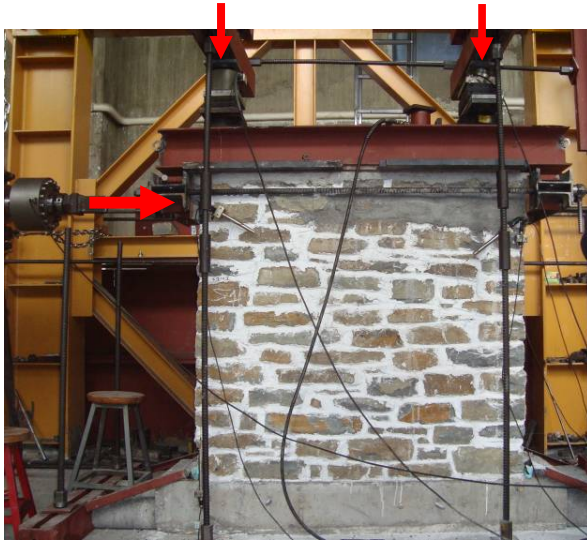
Stone masonry wall specimen S1M1. Loading arrangement being utilized.
